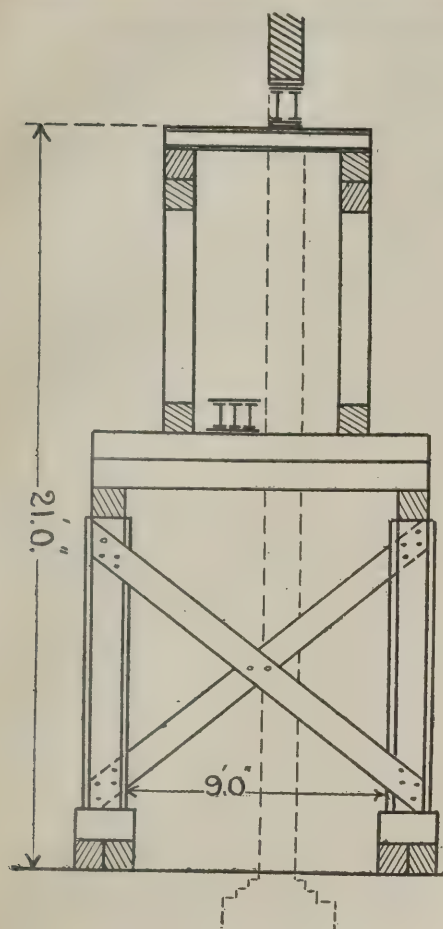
SHORING WITH NEW GIRDERS LAID ON TOP BAY.
